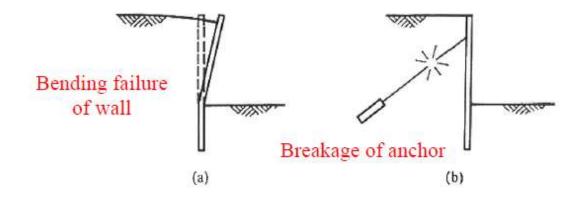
Mechanisms of failure of retaining walls (Atkinson, 1993)
